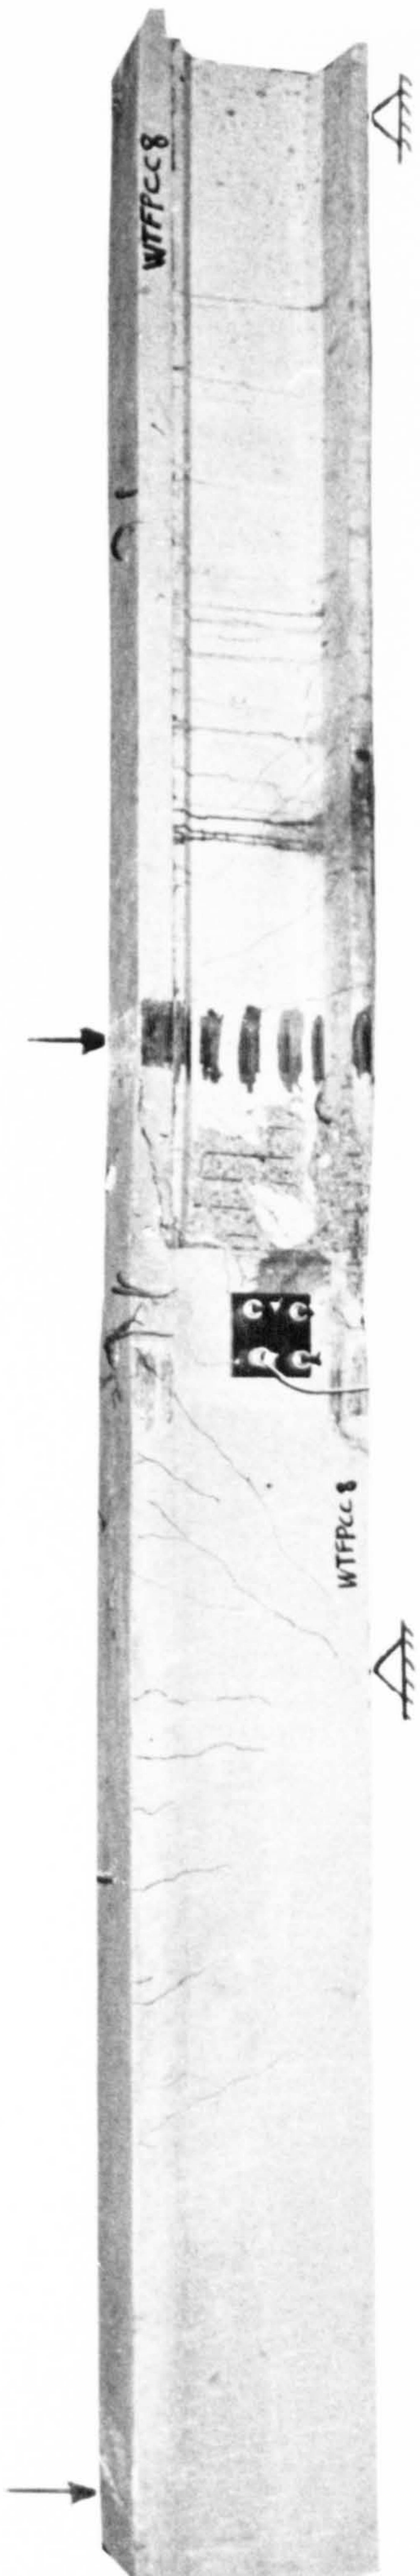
Longitudinal Elevation of Beam WTFPCC8 After Failure
